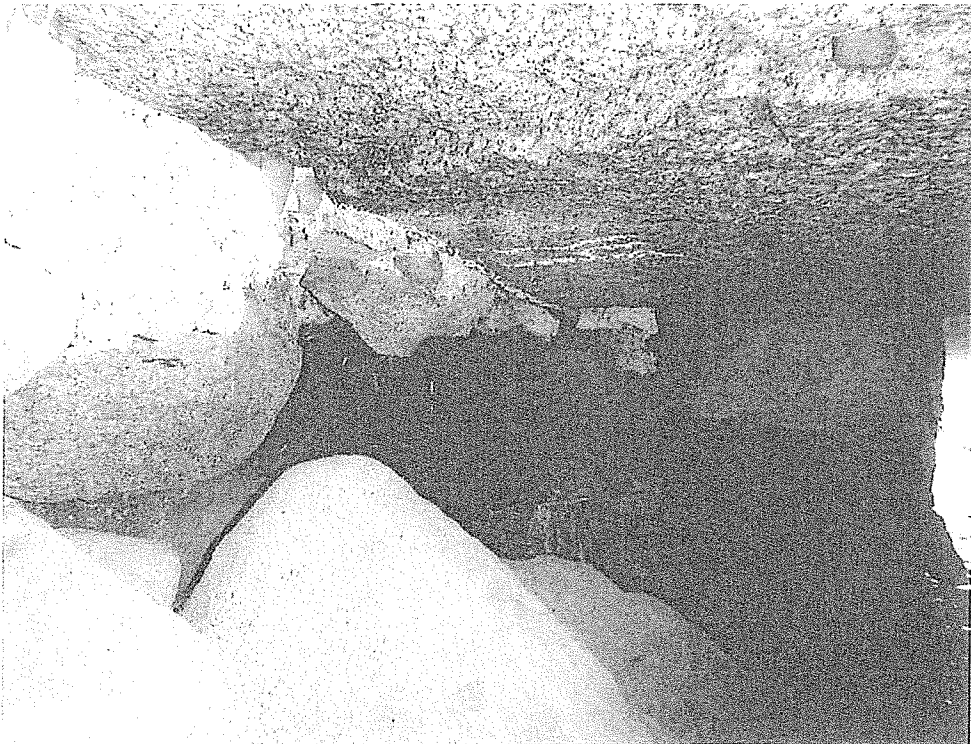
Slab 14-Complete loss of bearing area at the west breastwall.
